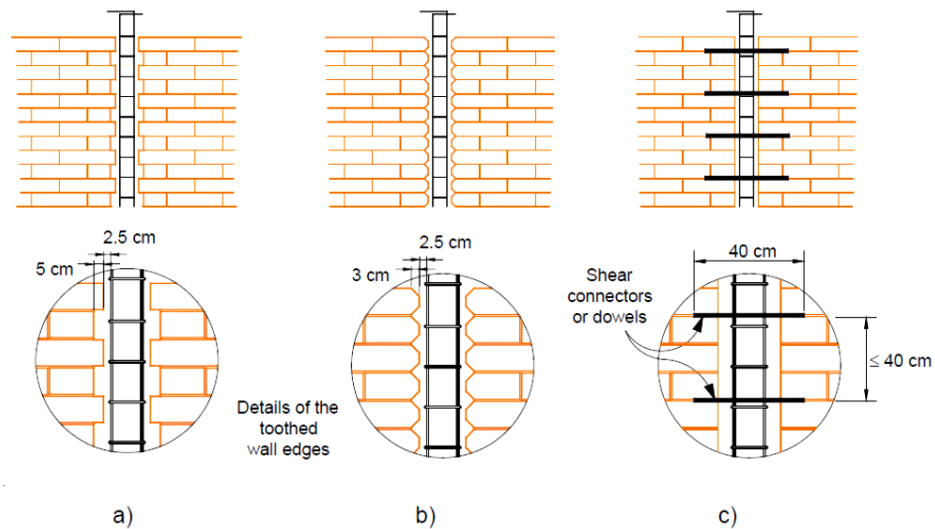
(a and b) Details of toothed connections to tie-columns and (c) shear connections (Meli et.al. 2011)
